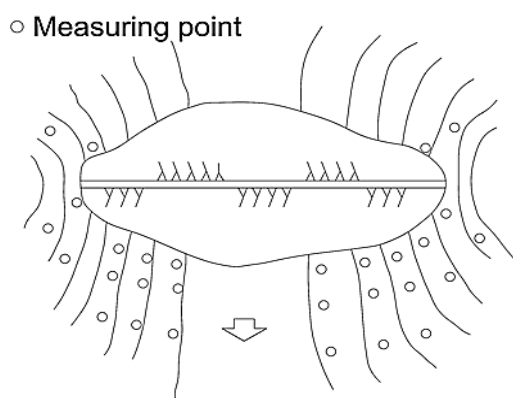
Layout for the bypass seepage and groundwater monitoring in an embankment dam
